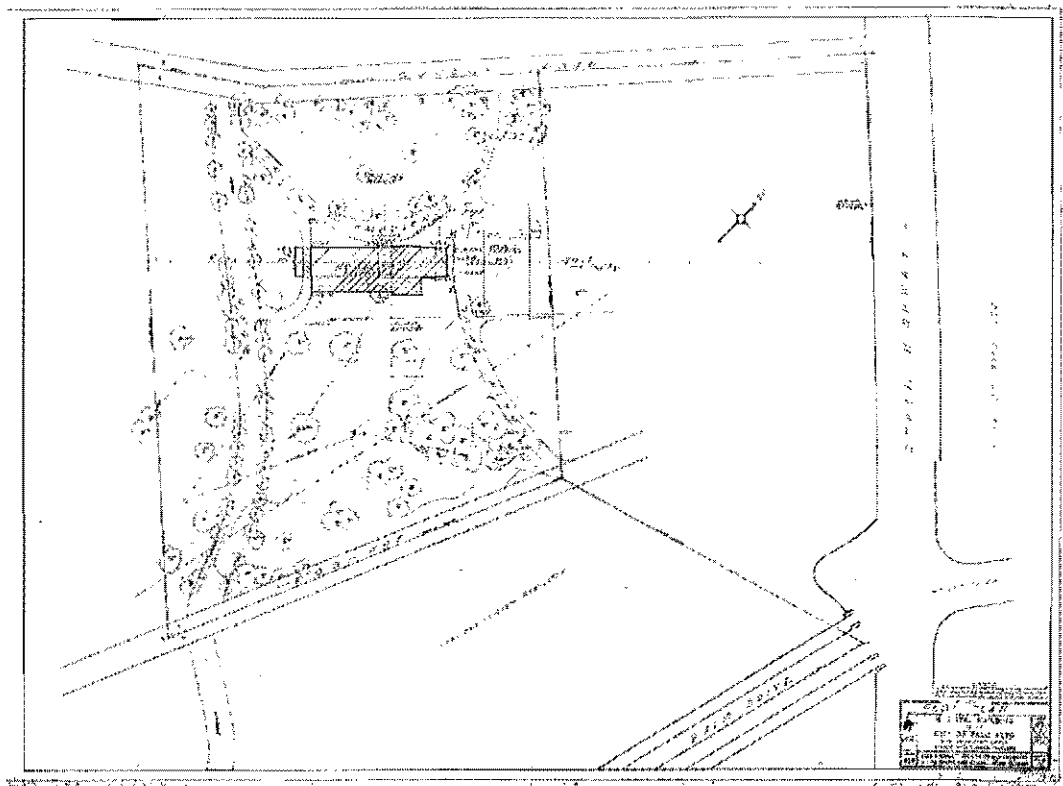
Site Plan for Palo Alto Hospital, 1930
